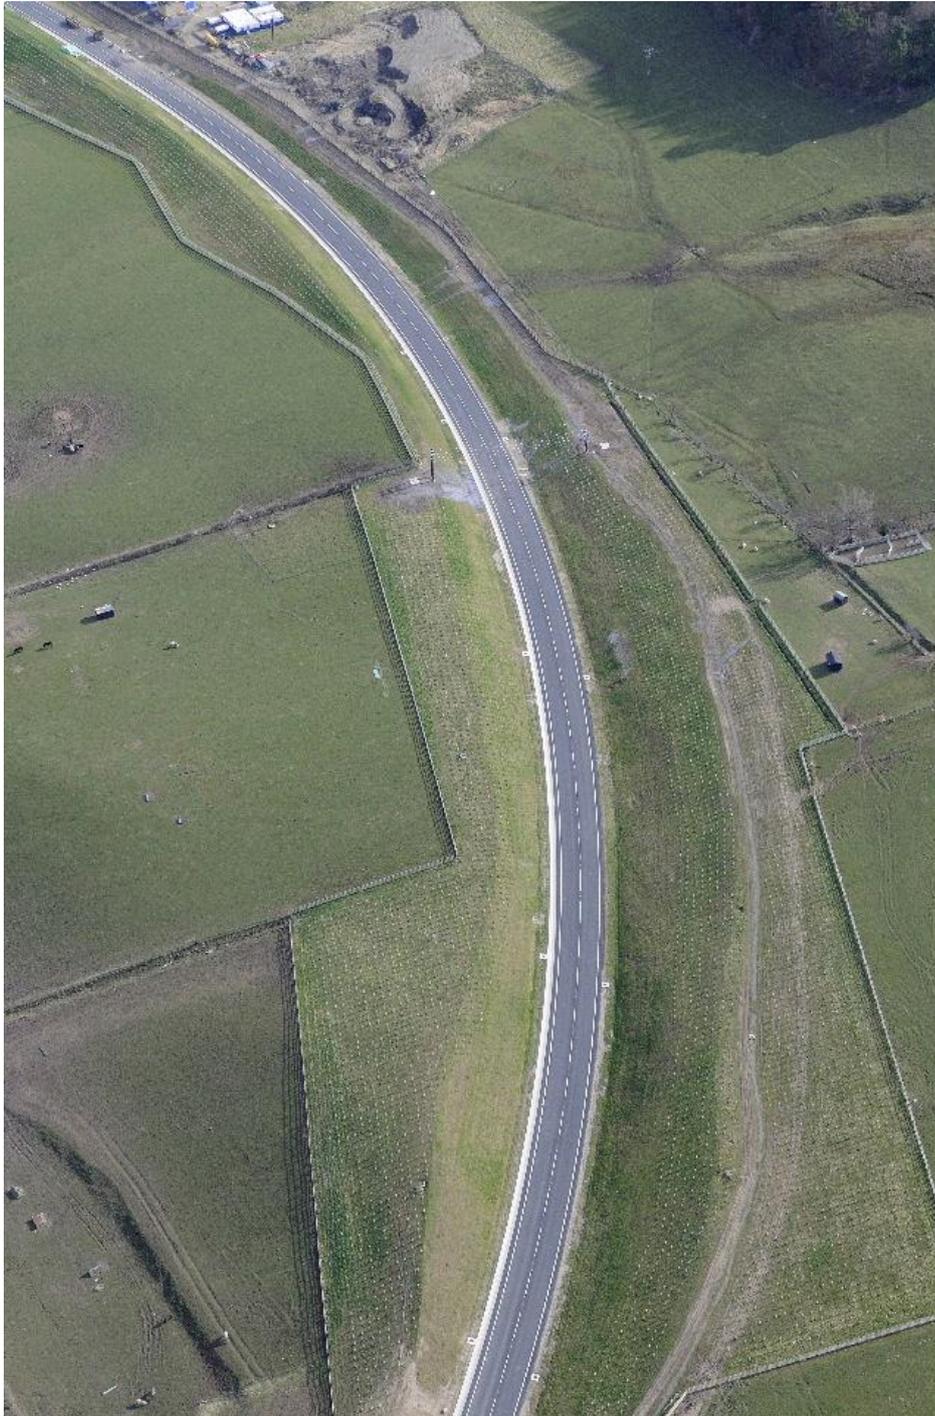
Aerial image of Haydon Bridge Bypass, A69
